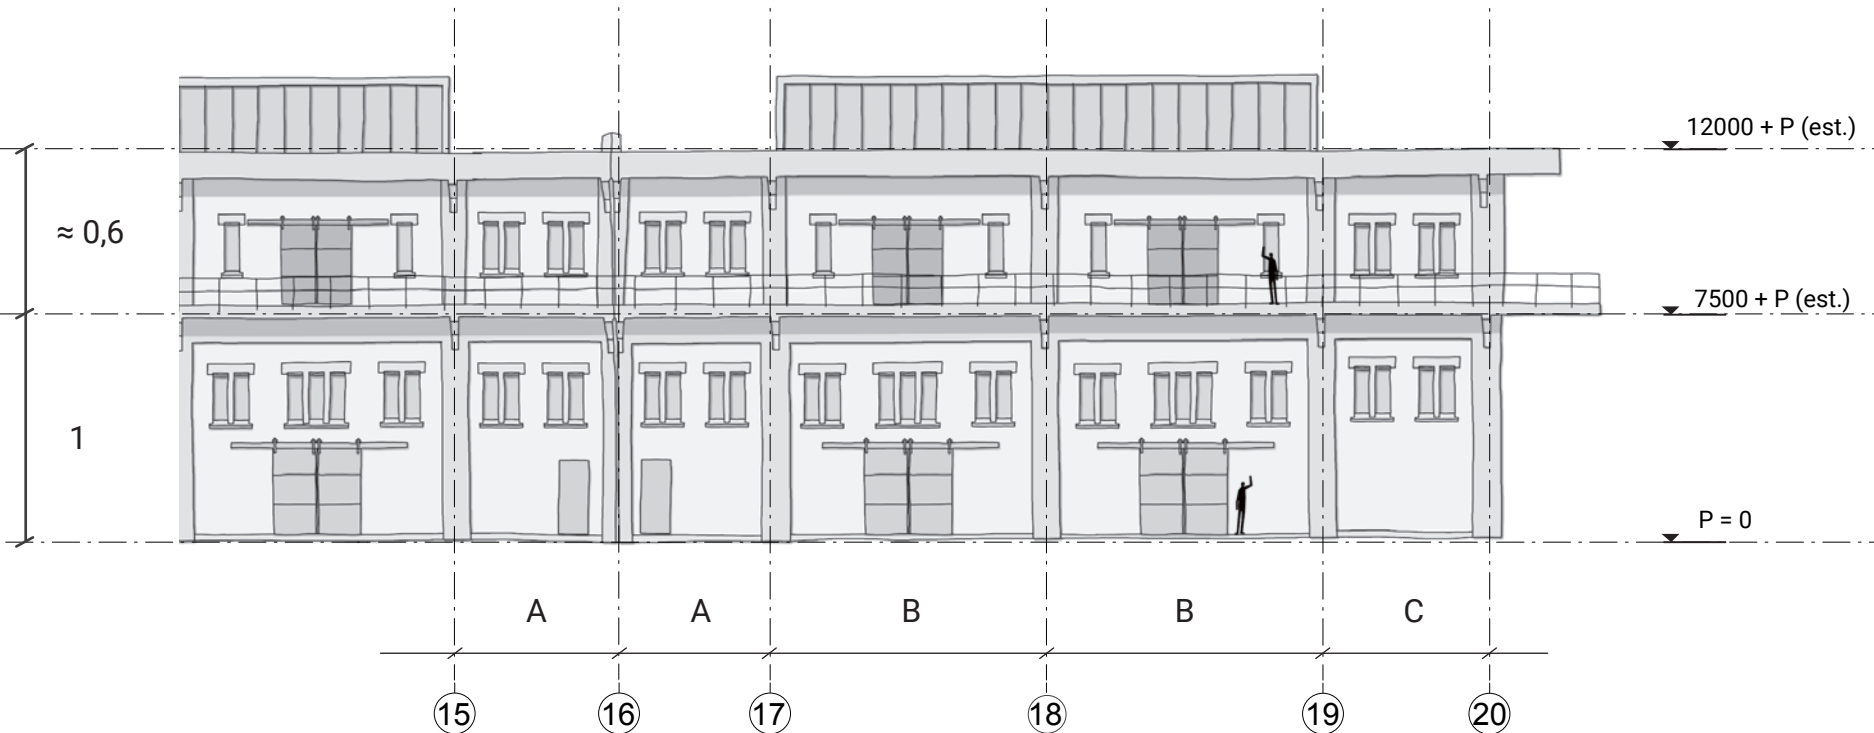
'Inside / Outside' drawing by Z. Spook, based on:
